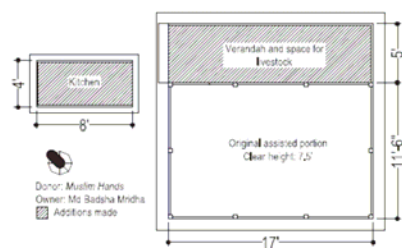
Showing Assisted shelter-type 1 (Muslim hands); plan and views (Author, 2008)
